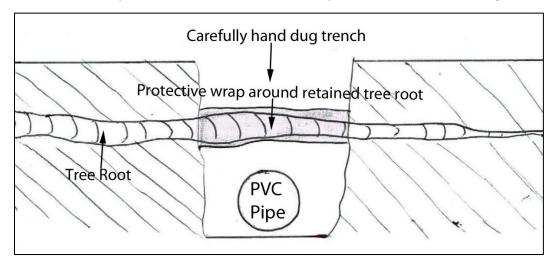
Figure B: Detail of recommended plumbing trenching within the TPZ radius.
